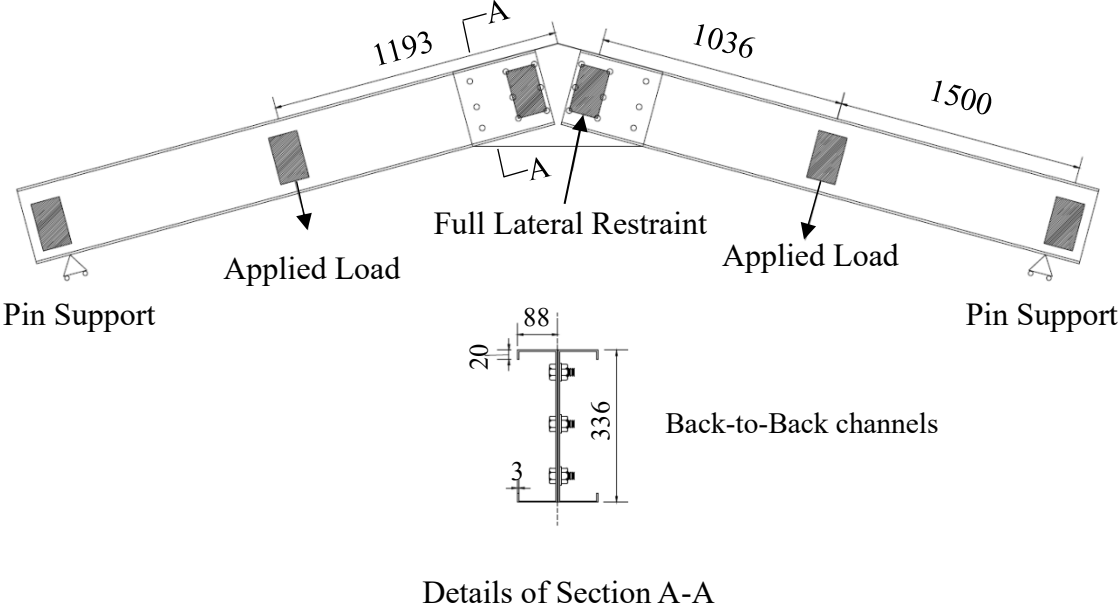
Details of apex joint test (dimensions in millimeters)
